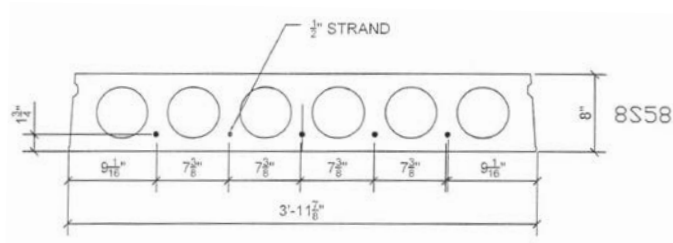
Typical precast hollow core concrete plank (Pittsburgh Flexicore)
